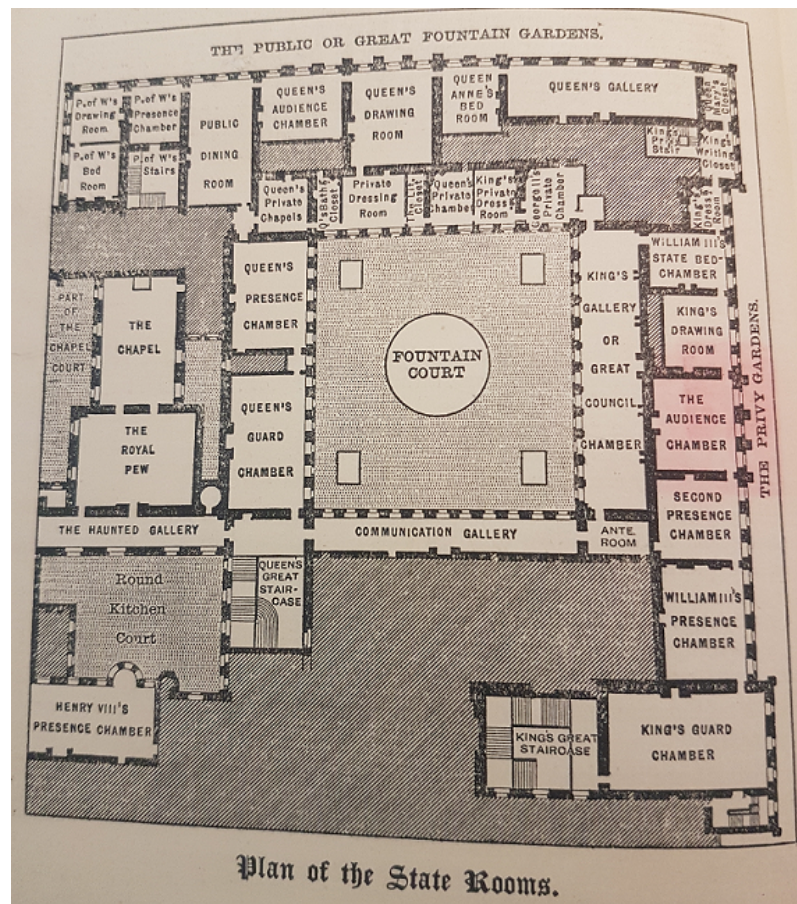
Ernest Law, Plan of the State Rooms, 1882
